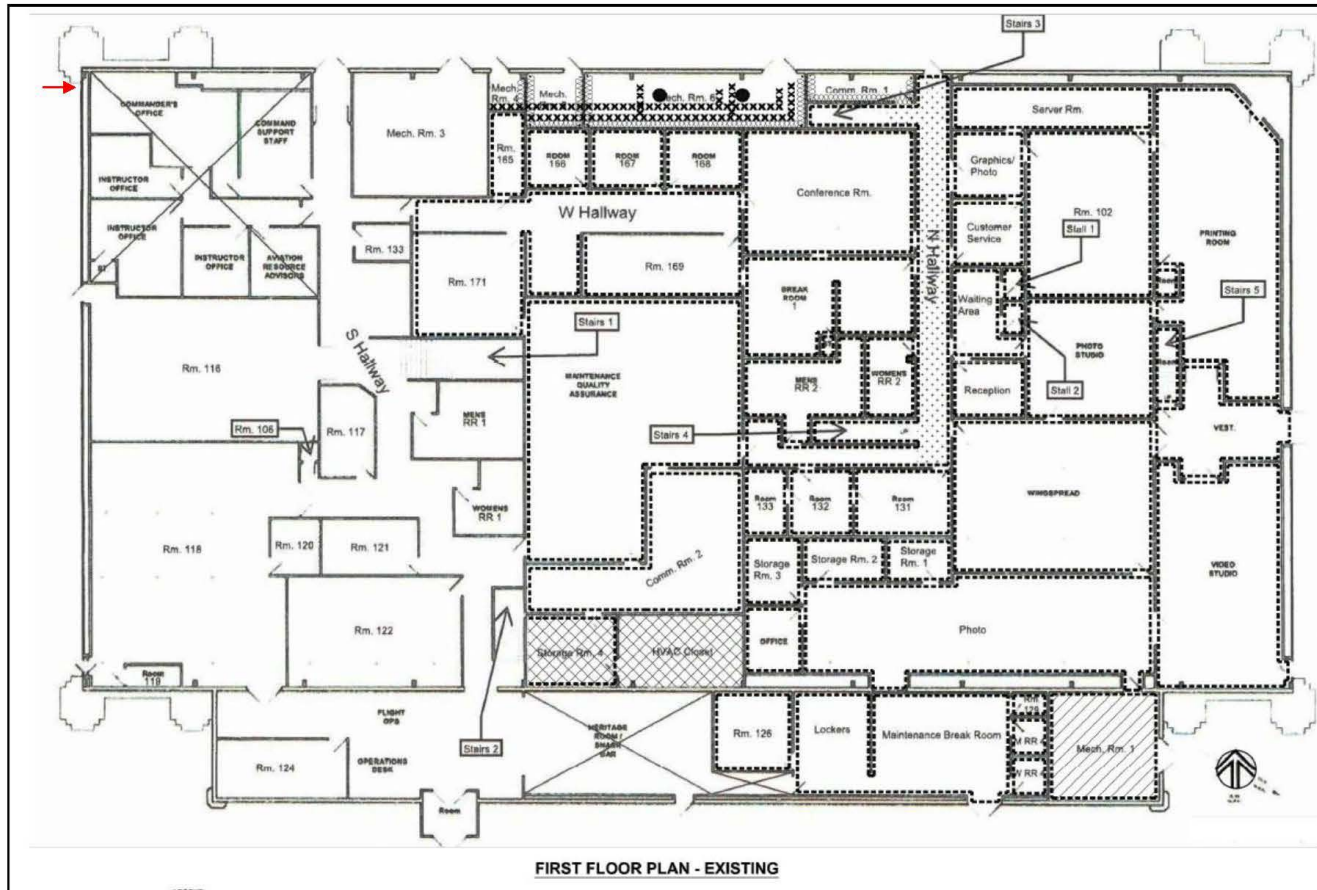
Existing First Floor Plan. Note: façade at top of image, existing rear addition at bottom of image. Though not noted on this plan, there is an existing door where the red arrow is indicated to the left. No alteration would occur to this door, note added to confirm no door is being added here as part of the proposed project.
